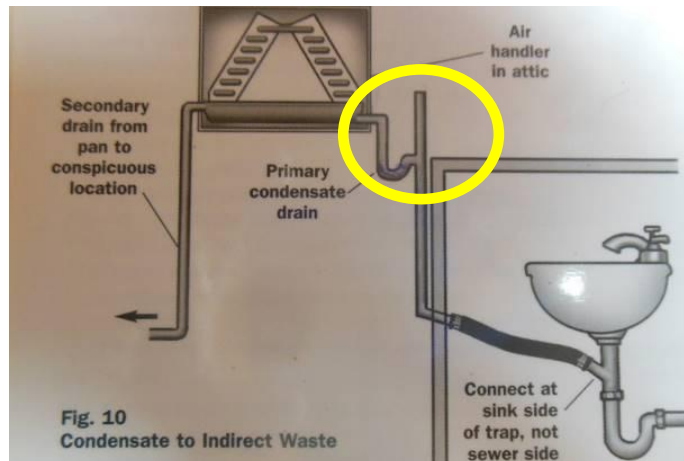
Photo illustrates the proper installation of a P-trap in the primary condensate drain line (stock photo).
